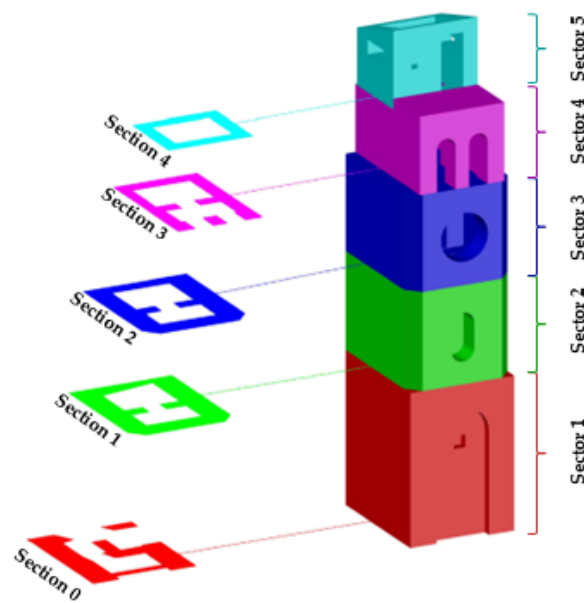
Subdivision of the tower in sectors and sections adopted for the EL1 checks.
